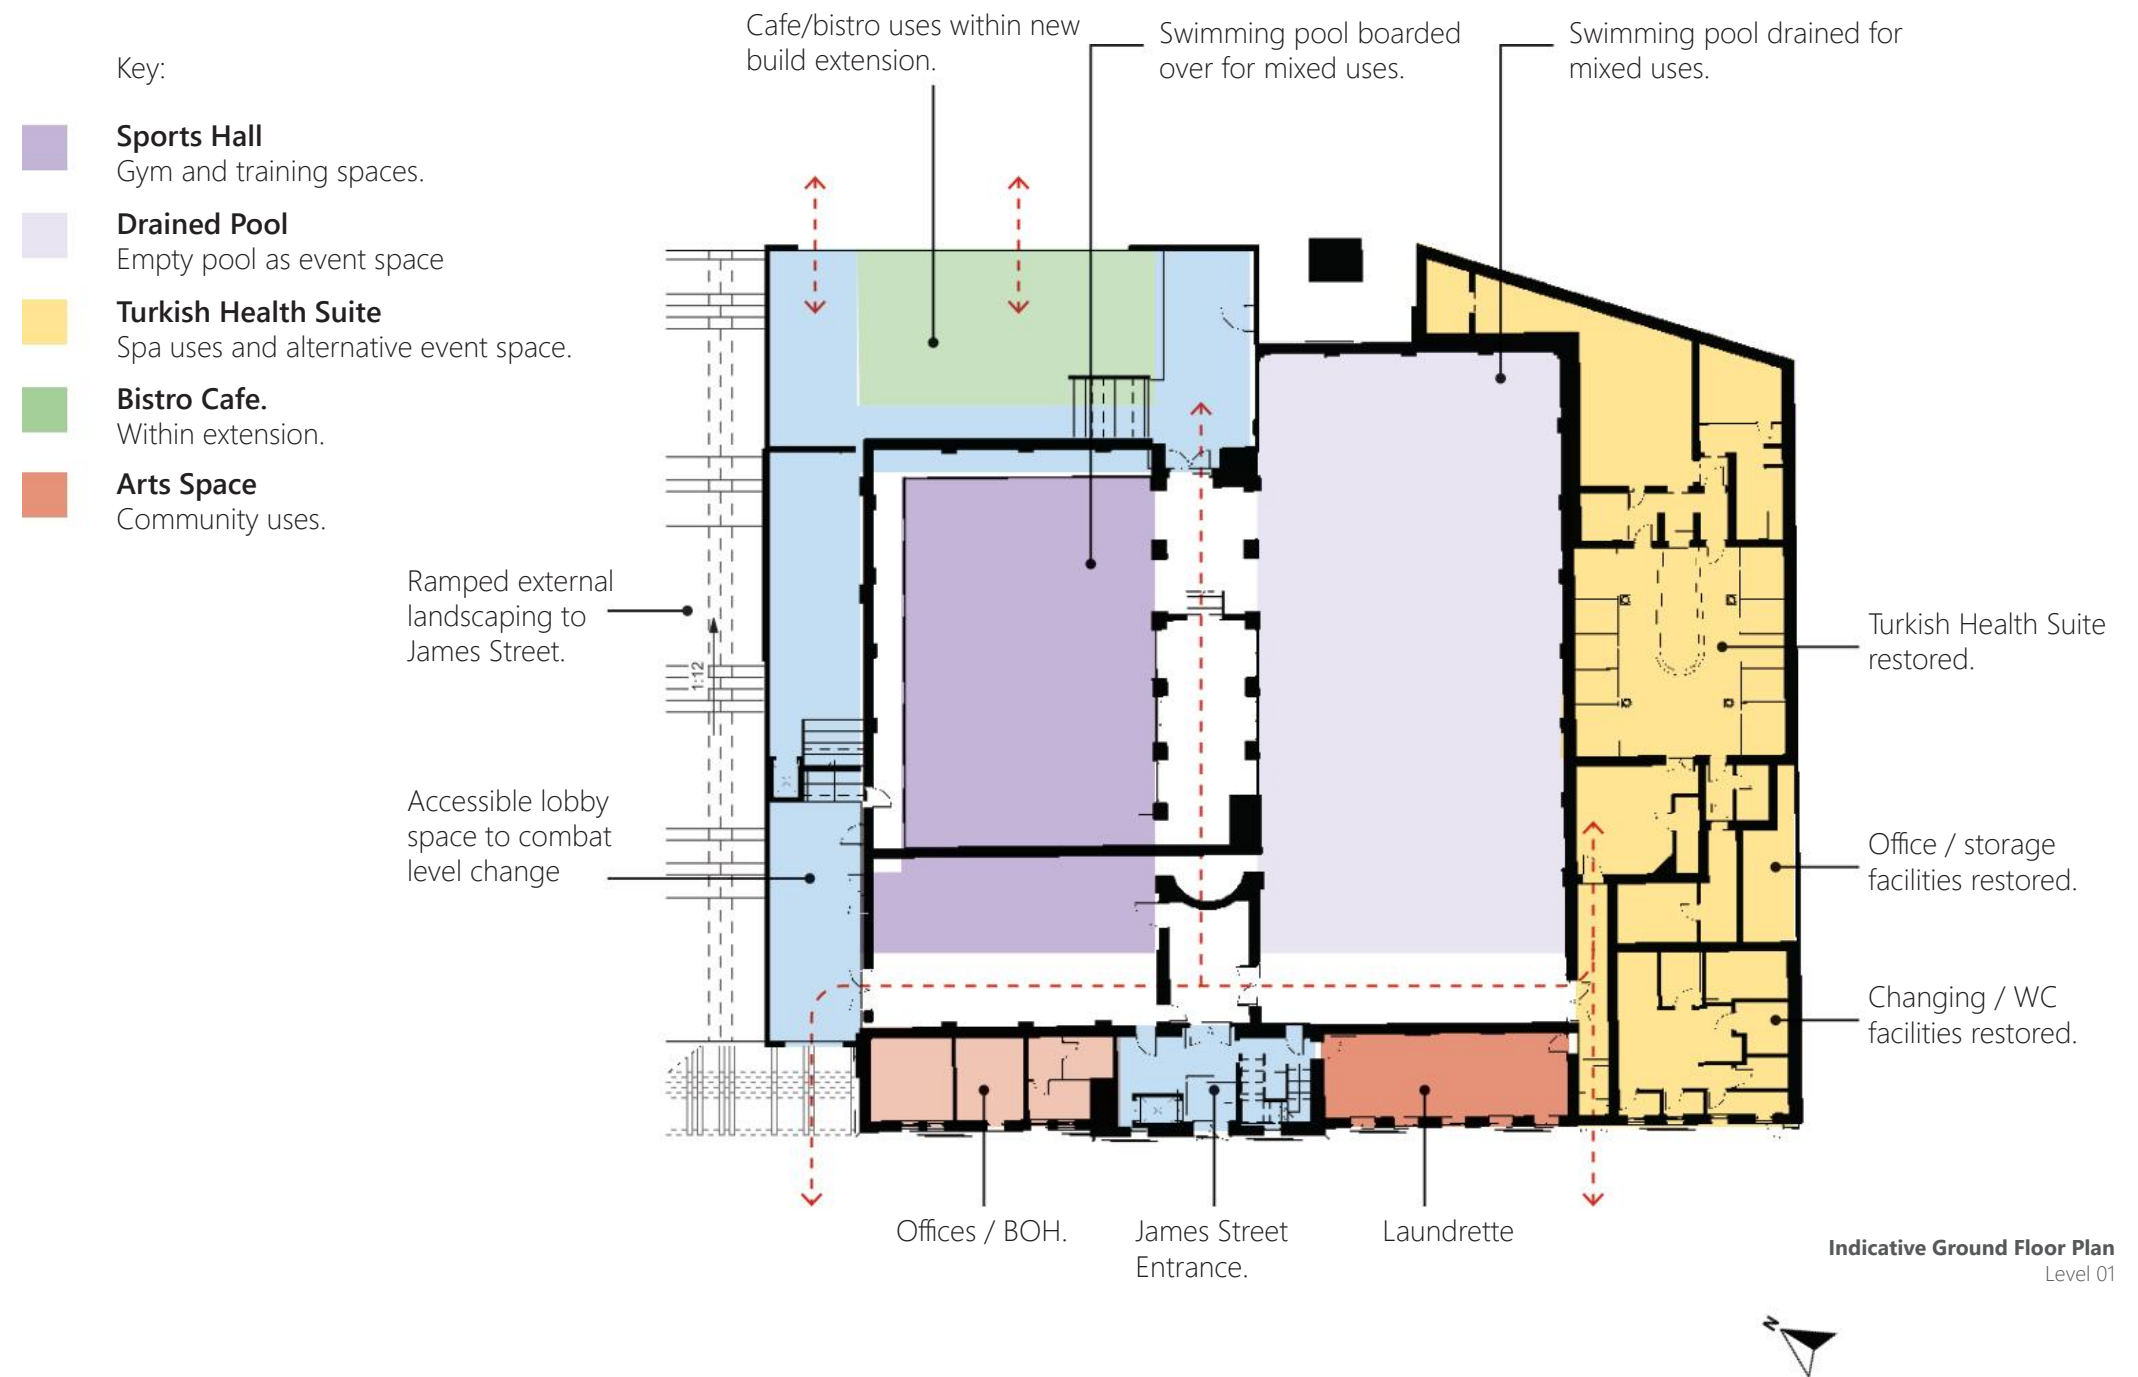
Ground Floor Plan, option 2, indicative use layout as proposed Level 00
